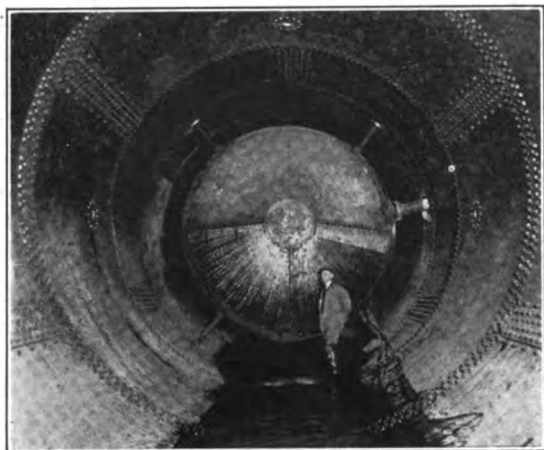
UPSTREAM END OF JOHNSON VALVE INSIDE OF PENSTOCK
